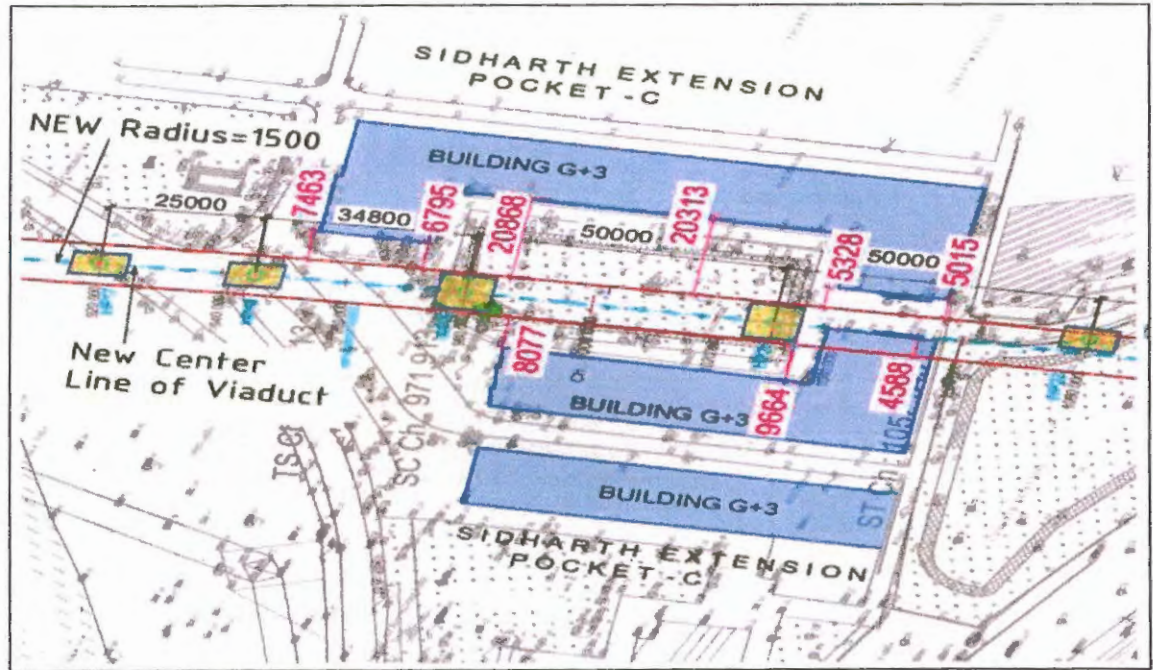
Plan Showing Alignment of Siddharth Extension-Old Alignment
